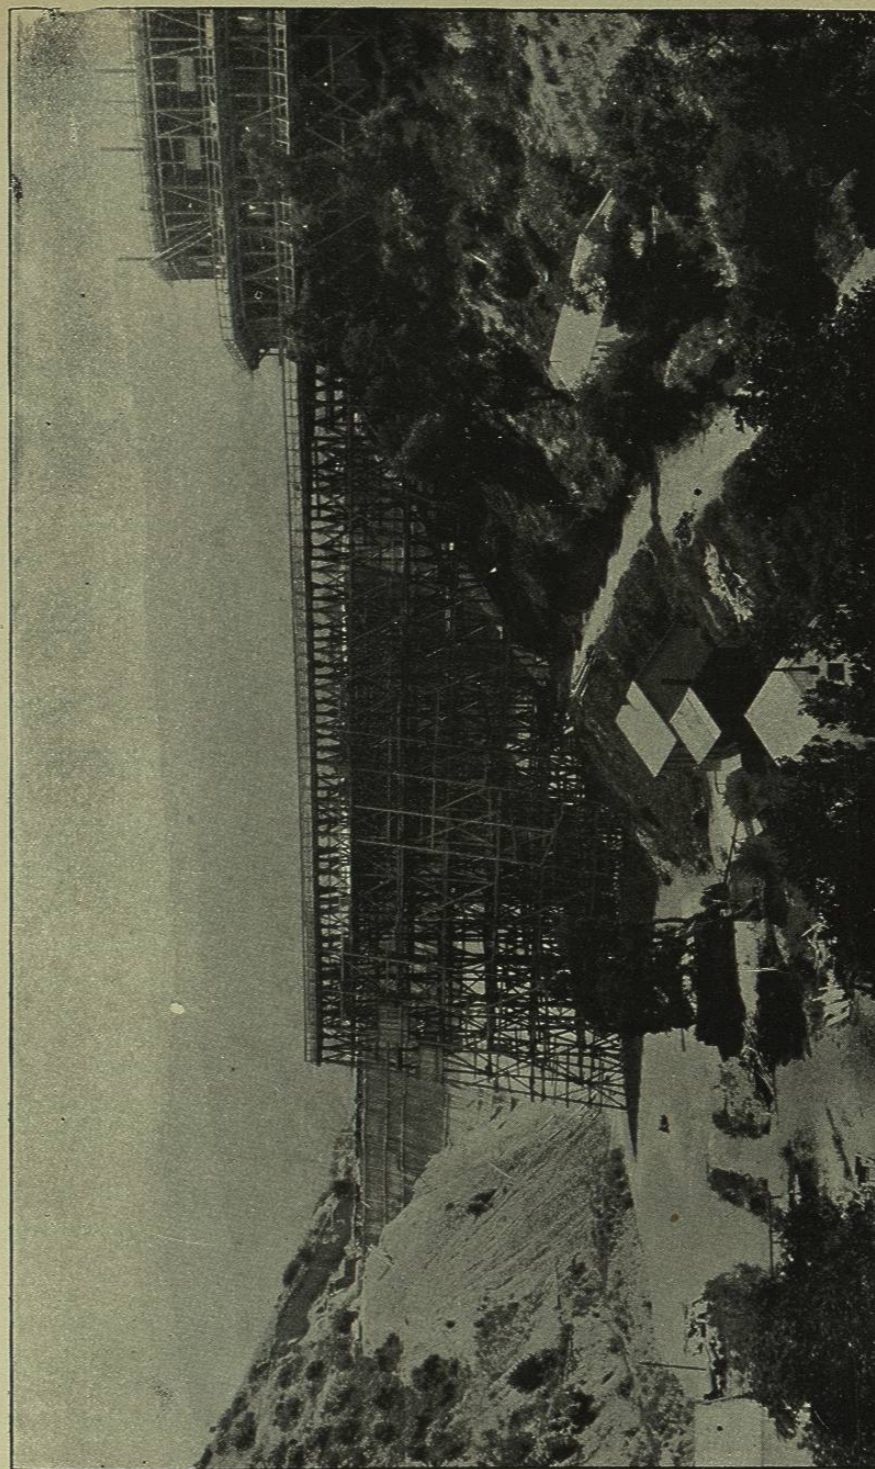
PLANT FOR MIXING AND HANDLING CONCRETE AT SAN MATEO DAM.
